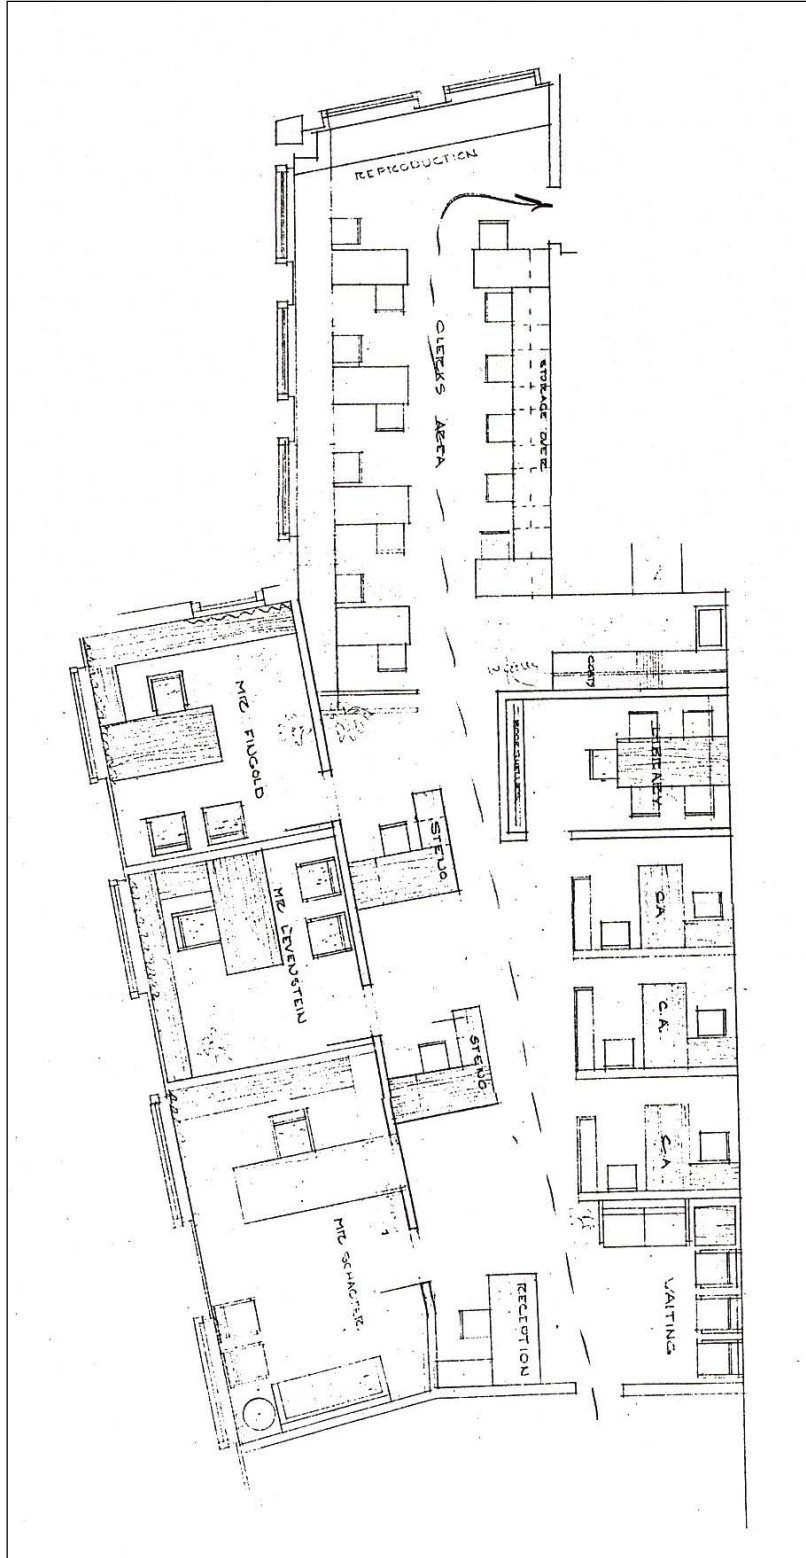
Architect's Plans, "Proposed office design" for ground floor, 1960. (Courtesy of the City of Winnipeg Archives, Plan #1849/1960.)
